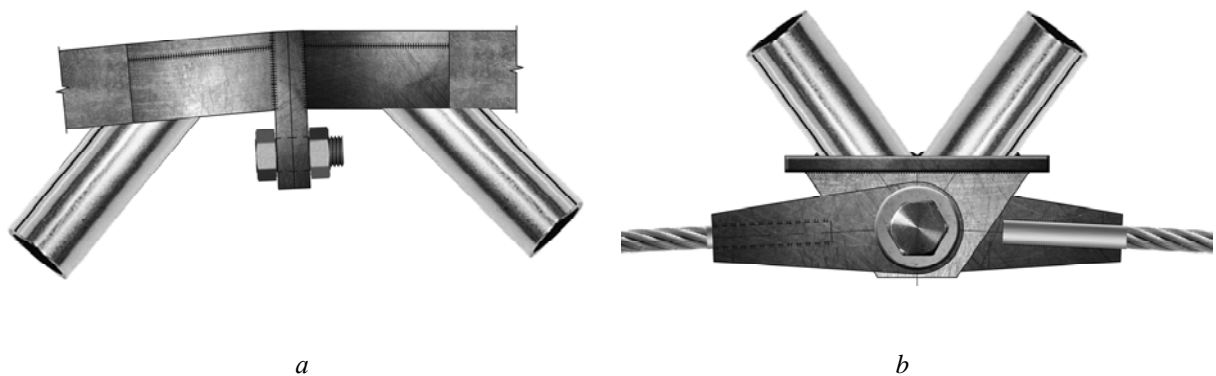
Bolted connections on top chord (a) and bottom chord (b)
